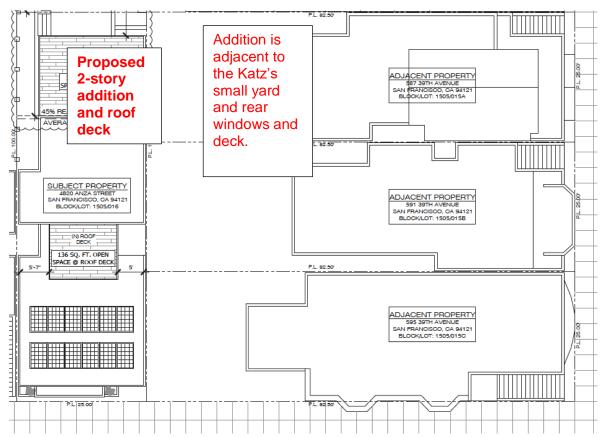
Proposed Two-Story Addition and Roof Deck location in relation to the Katz's home.
